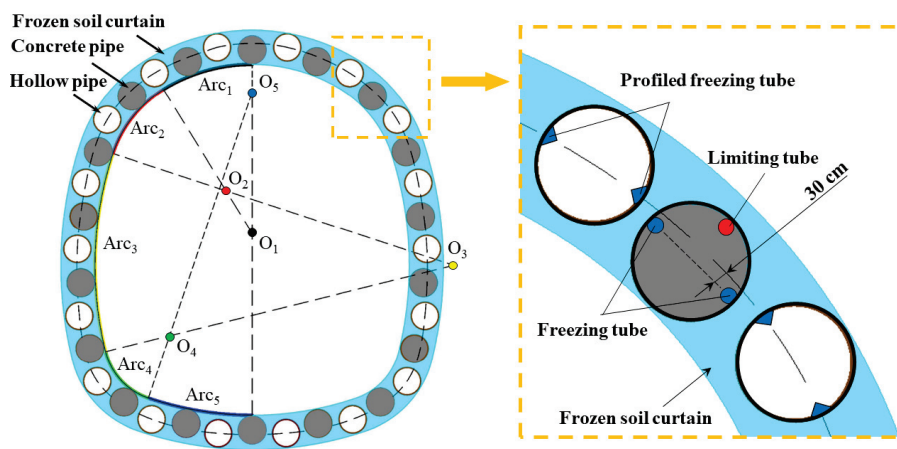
Layout of pipe roof and freezing tube in Gongbei Tunnel.
